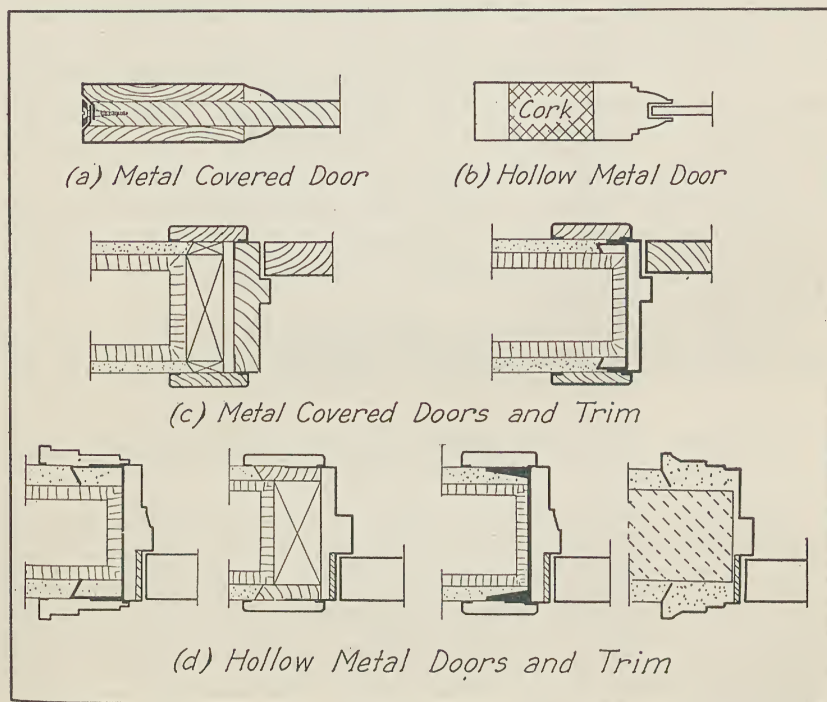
Metal-covered and Hollow Metal Doors and Trim
